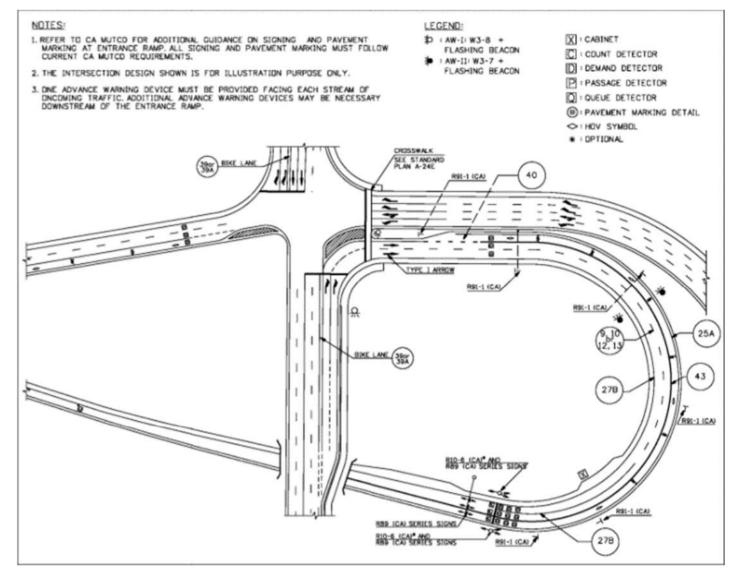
Typical signing/pavement marking for 3-lane metered loop on-ramp (2 GP lanes+1 HOV lane) Source: Figure 3-5 of the Caltrans Ramp Metering Design Manual, 2016
